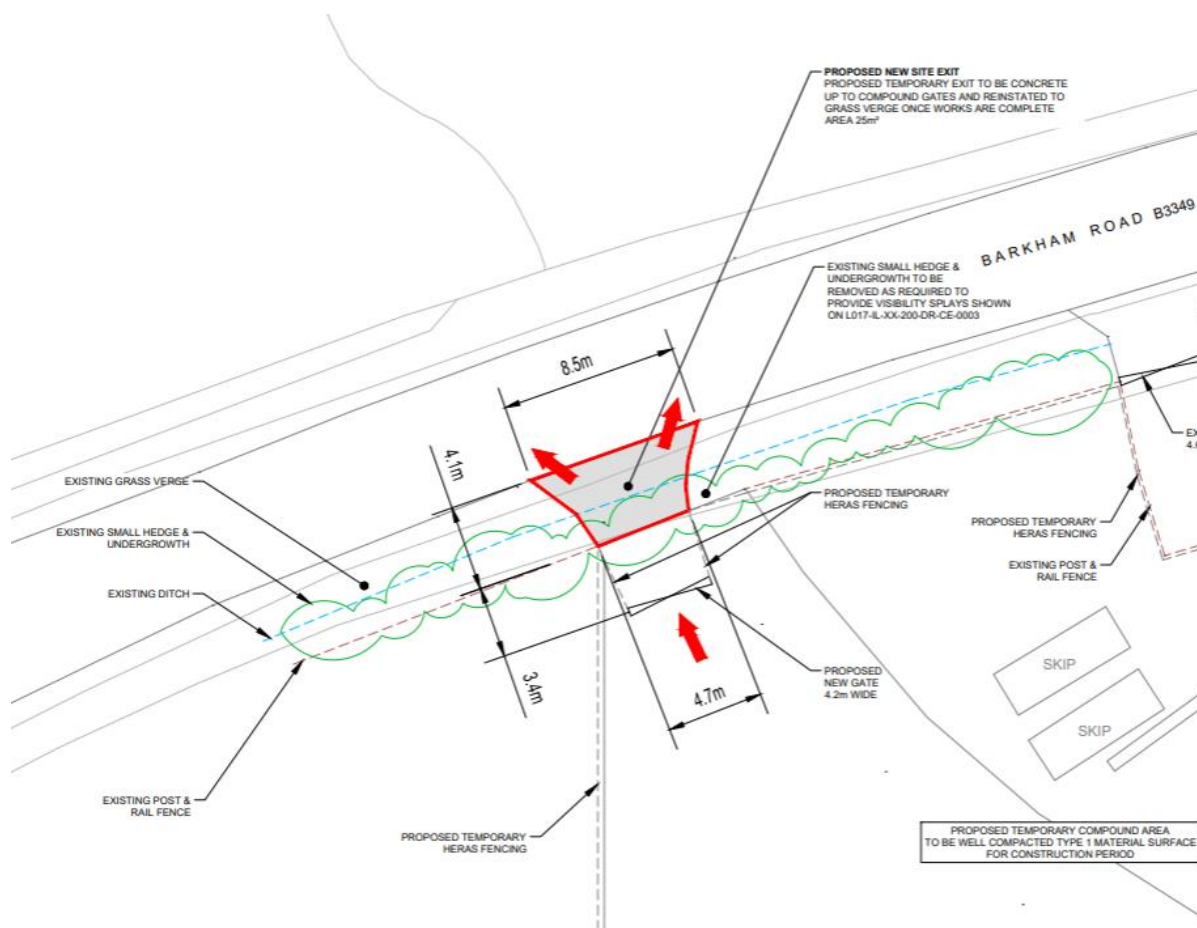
Proposed Site Layout for the Proposed Development
